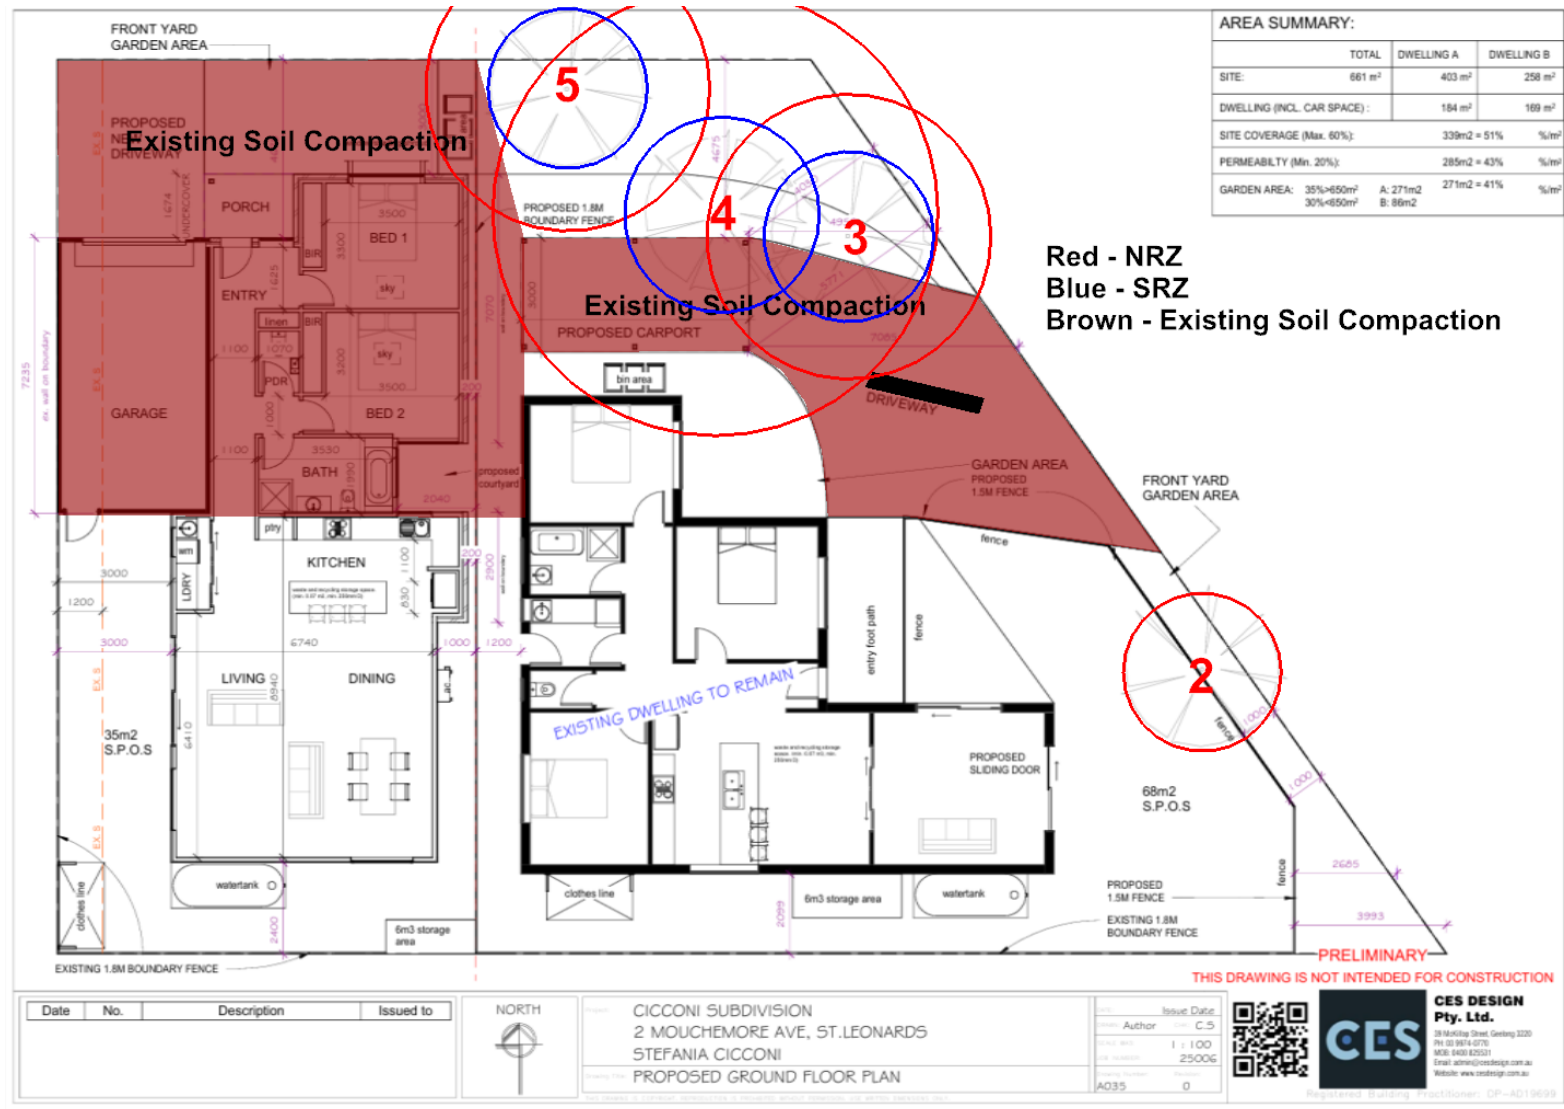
Proposed Sub-division and Carport, NRZs, SRZs and Existing Soil Compaction
